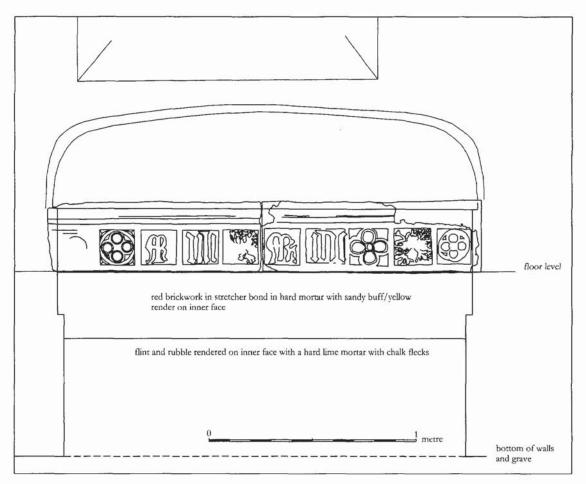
South elevation of monument, showing below-ground structure of the front retaining wall of the tomb cavity
